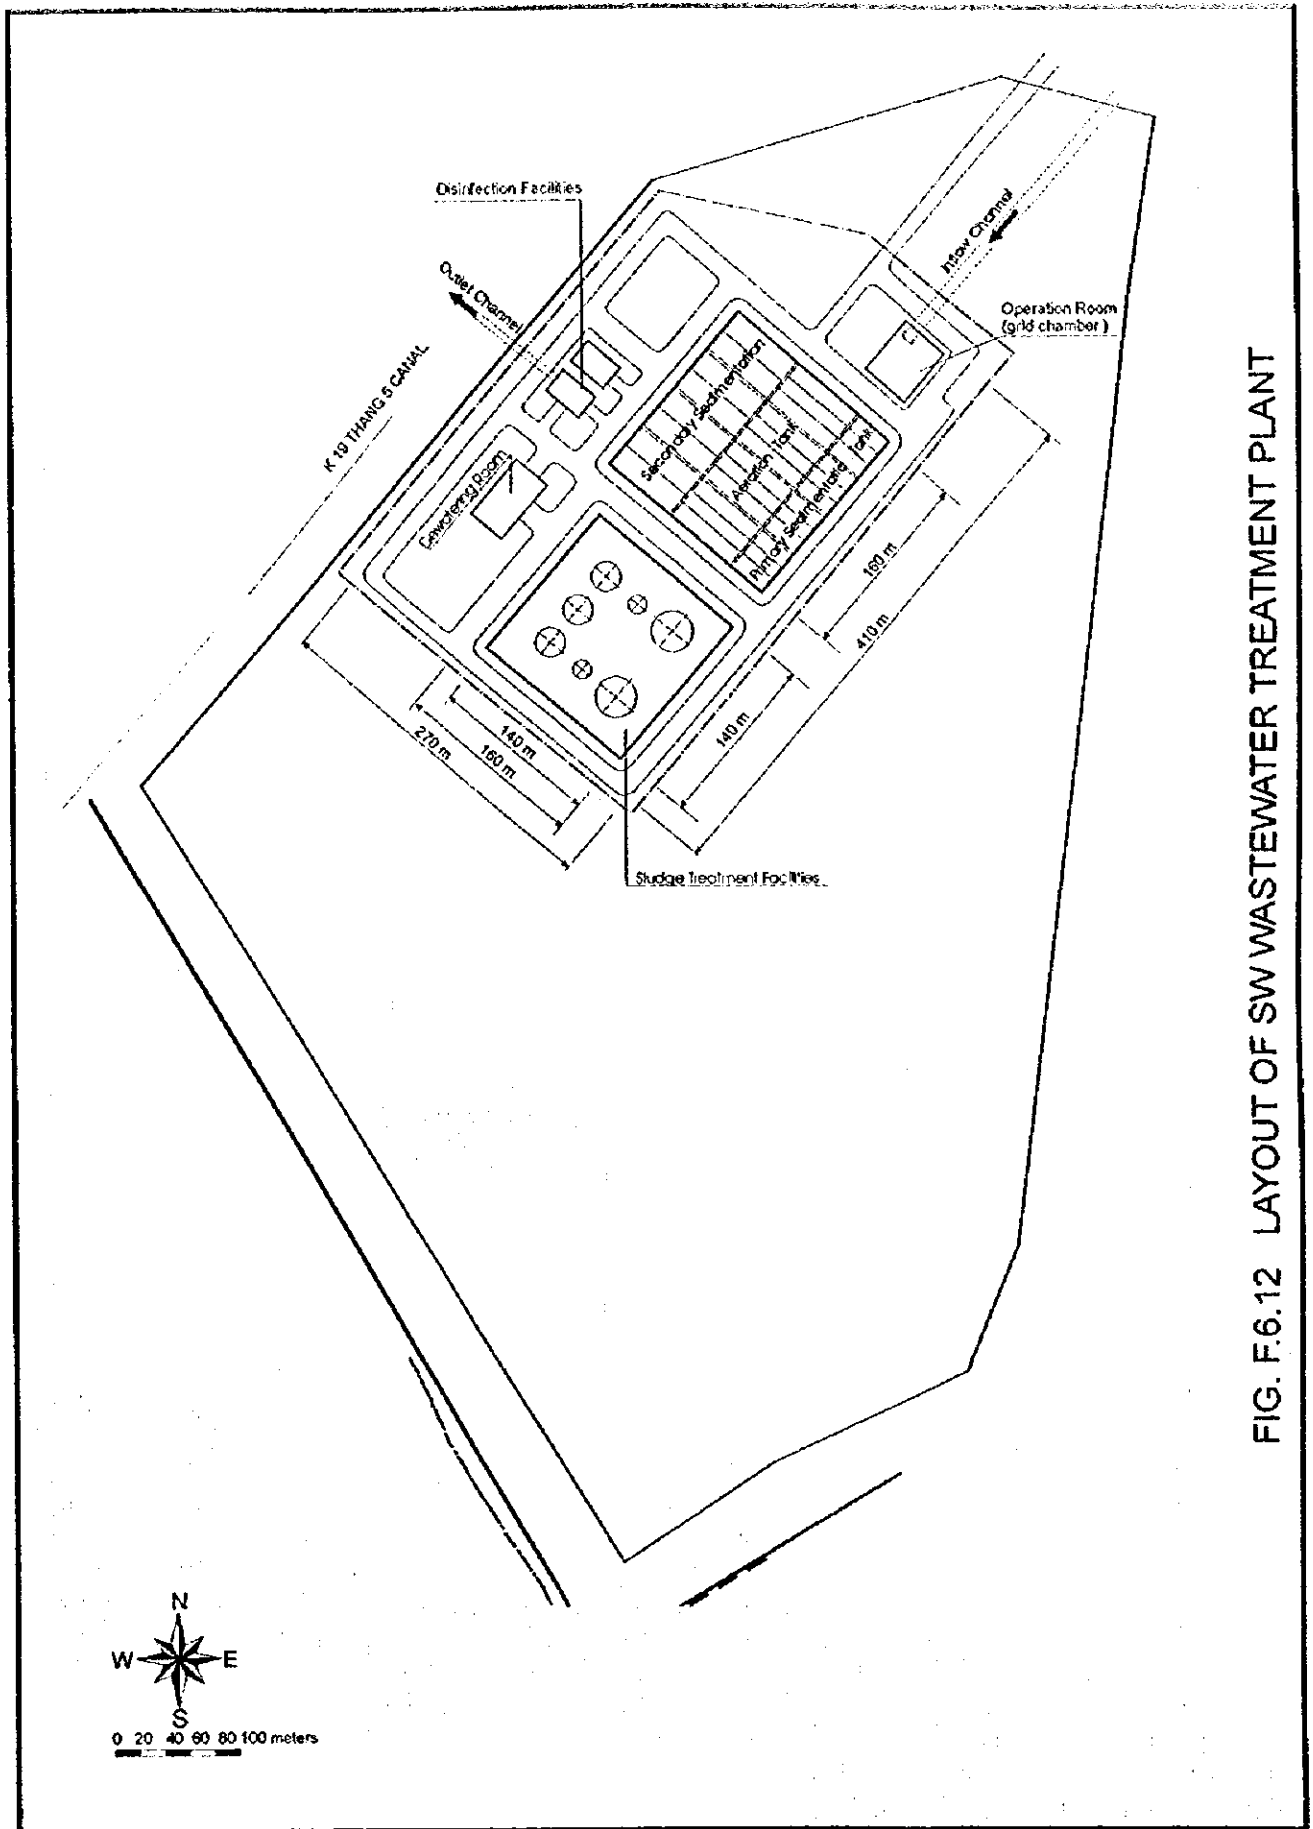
LAYOUT OF SW WASTEWATER TREATMENT PLANT
